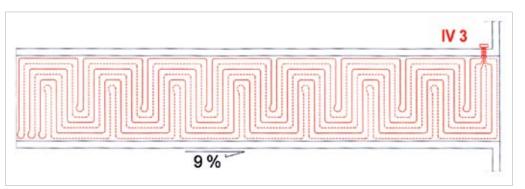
REHAU outdoor underfloor heating: Heating a ramp (installation sketch)
